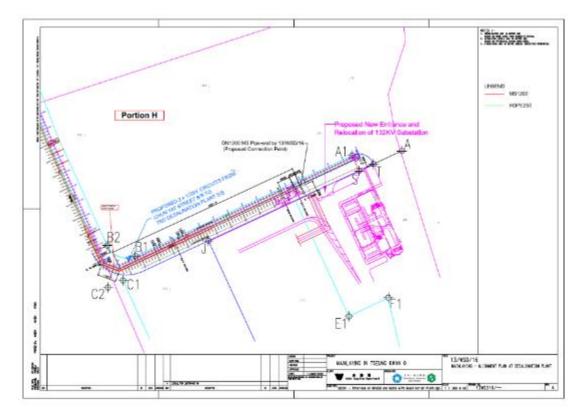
Location Plan for CH.CT 0+07 - 2+58
